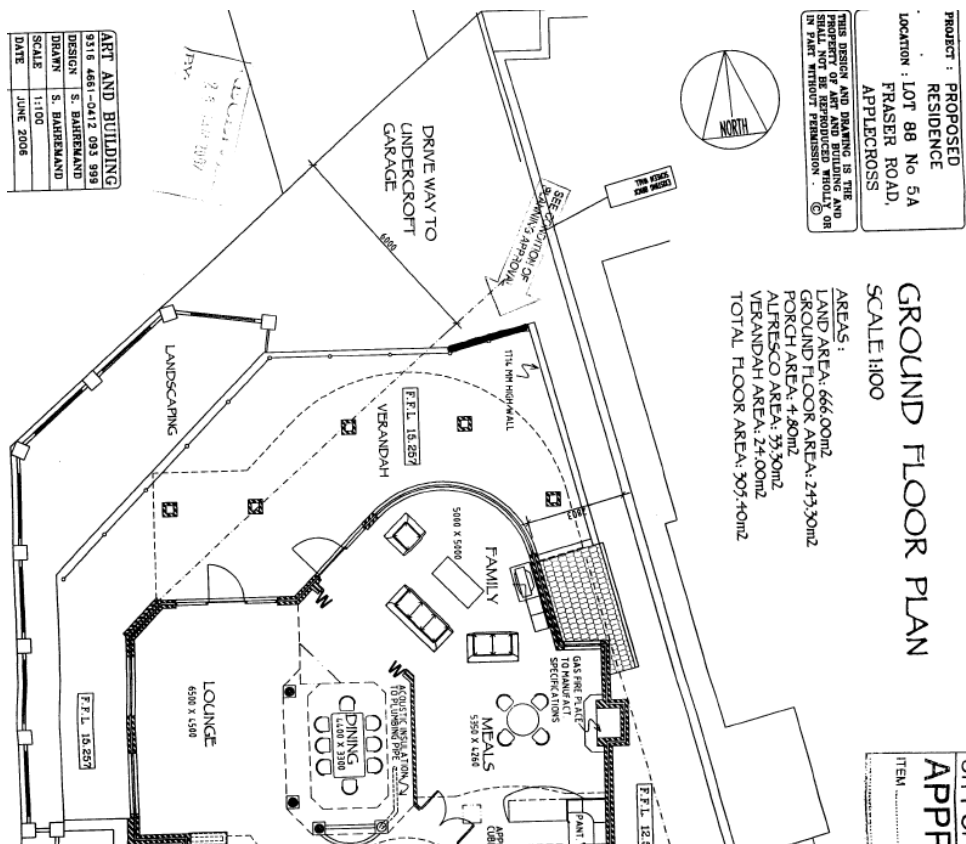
Approved Ground Floor Plan from DA-2006-1488 issued for 5A Fraser Road. Top of image facing north.
